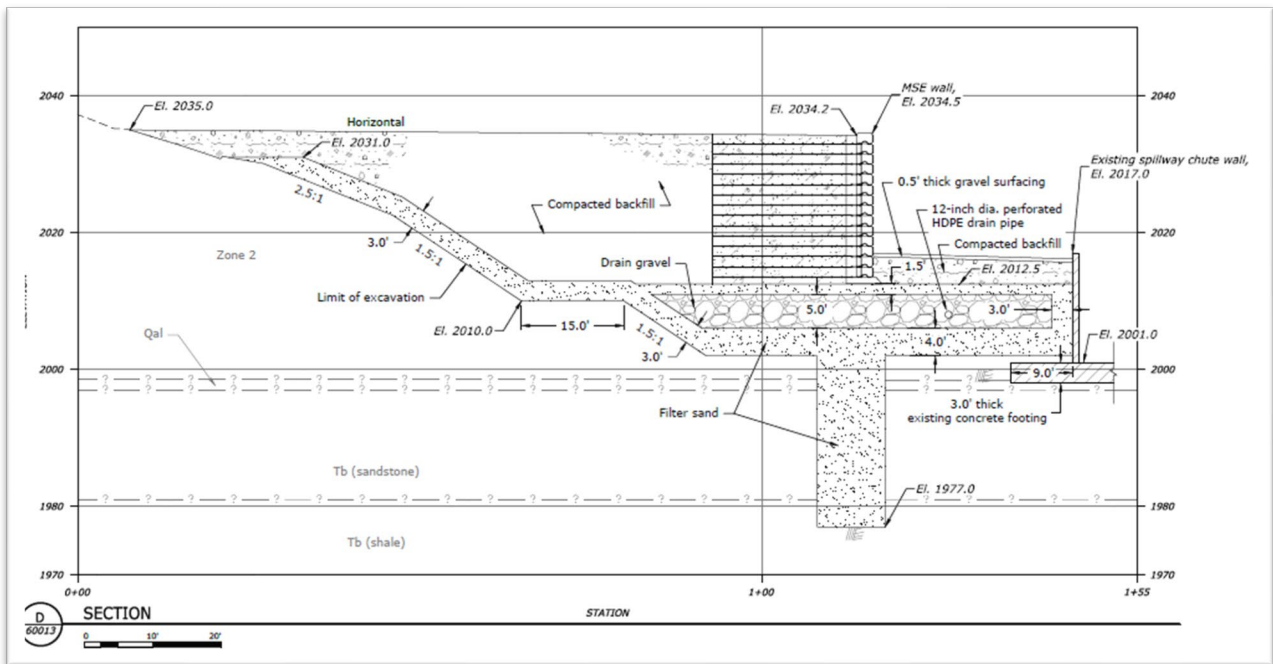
Draft Design Drawing of Proposed Action Alternative – Seepage Filter and Berm Cross Section on North Side of Spillway.
